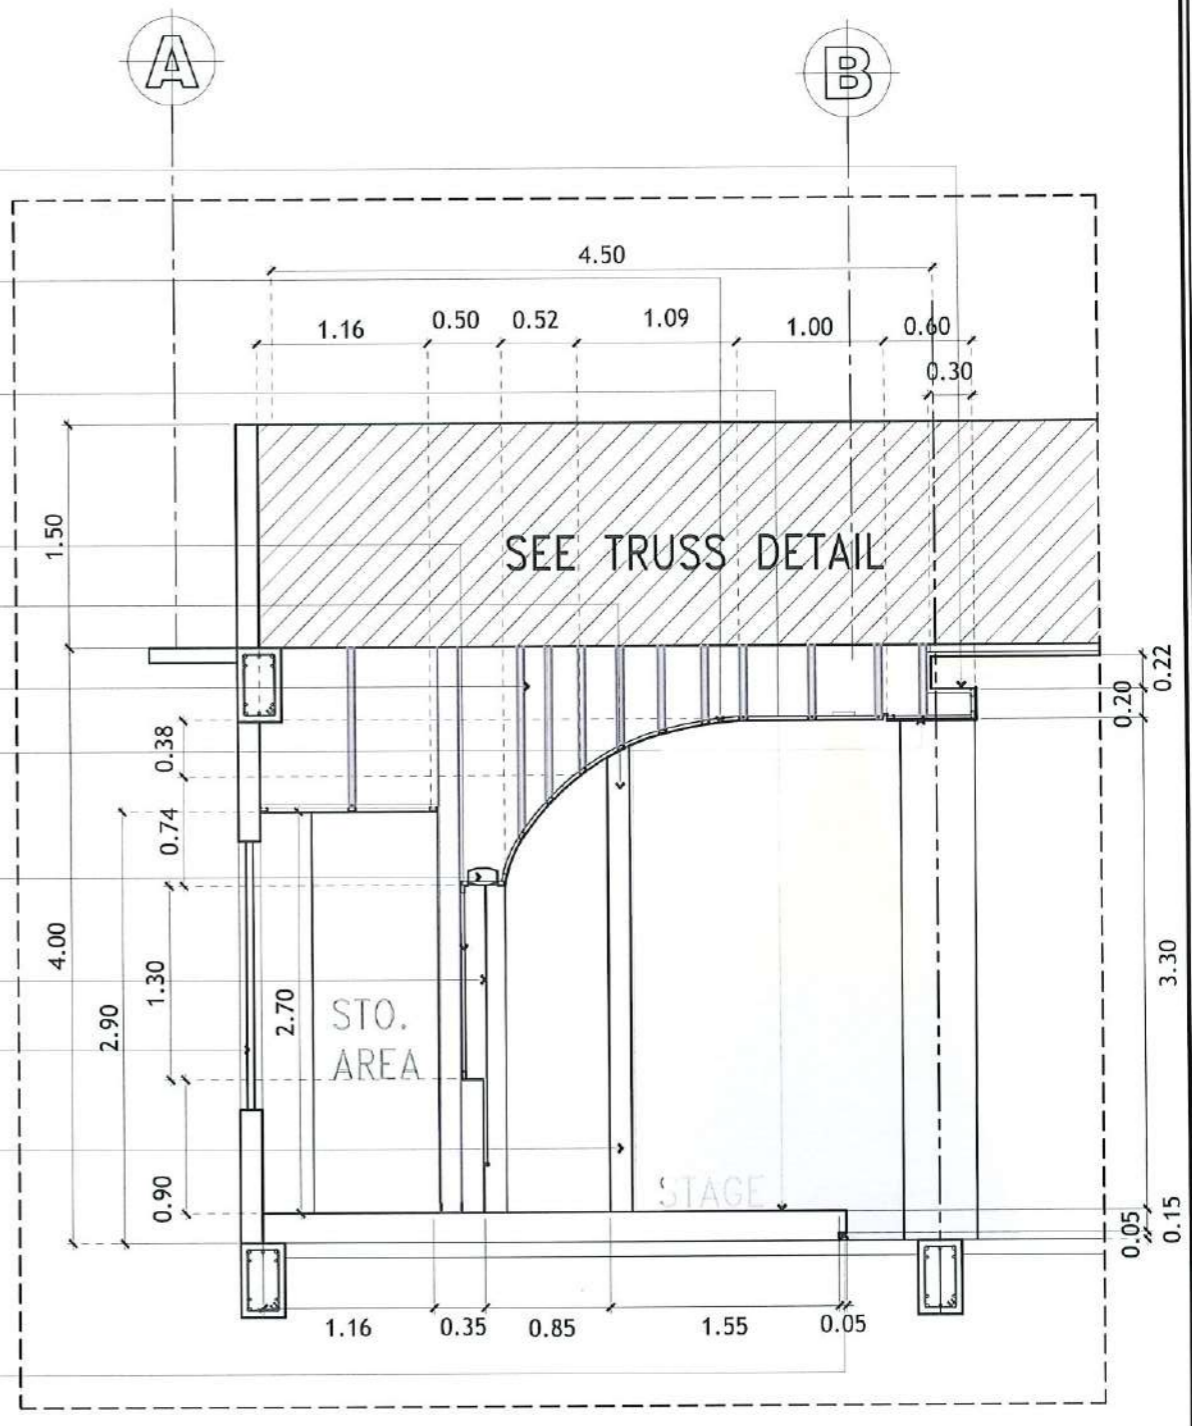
DETAIL DIAMOND CUT POLYESTER ACOUSTIC PANEL WALL
